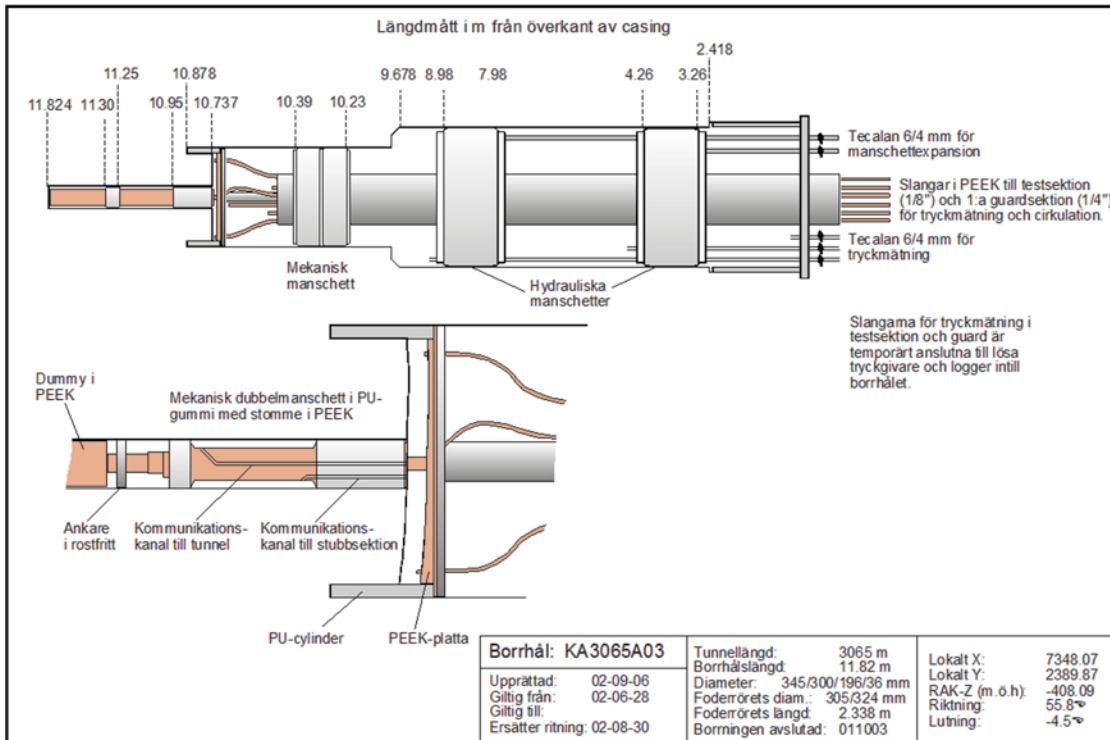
Drillhole installations in KA3065A03, displaying packer positions: 3.26-4.26 m drillhole length from top of casing (TOC); hydraulic packers. 7.98-8.98 m drillhole length from TOC; hydraulic packers. 10.23-10.39 m drillhole length from TOC; mechanical packer. 10.737-10.95 m and 11.25-11.30 m drillhole length from TOC; mechanical double packer delimiting the slim hole section. Measures according to instrument drawing no 3-2054.
